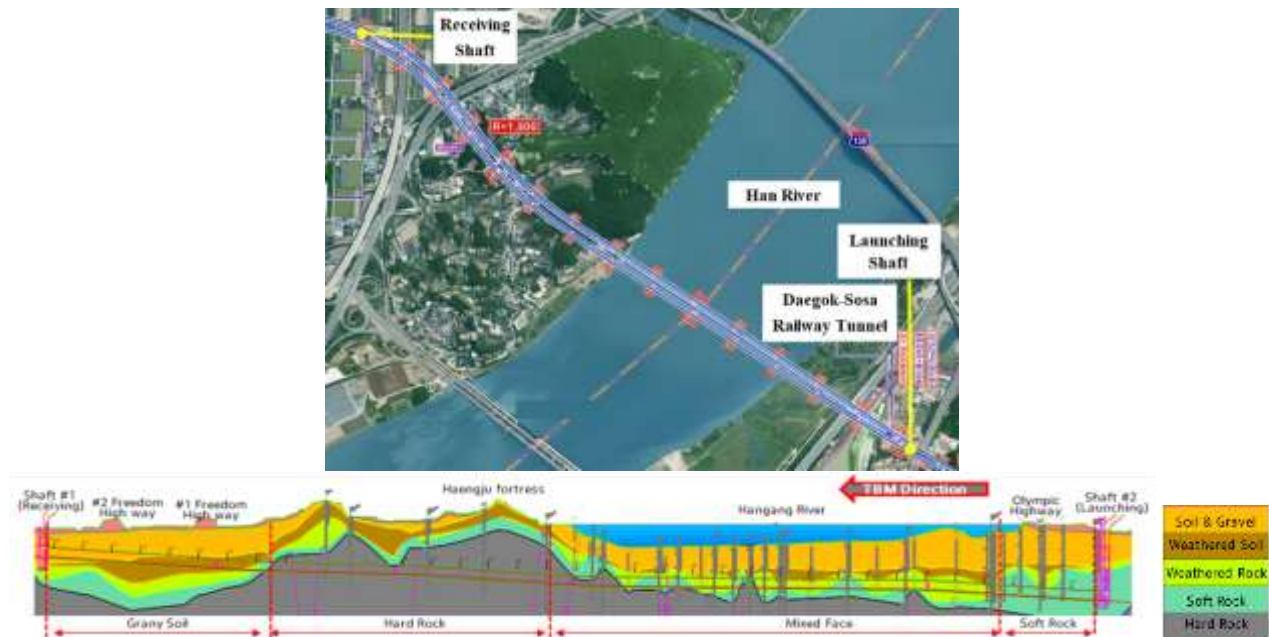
Plain view and profile of Daegok-Sosa railway tunnel
